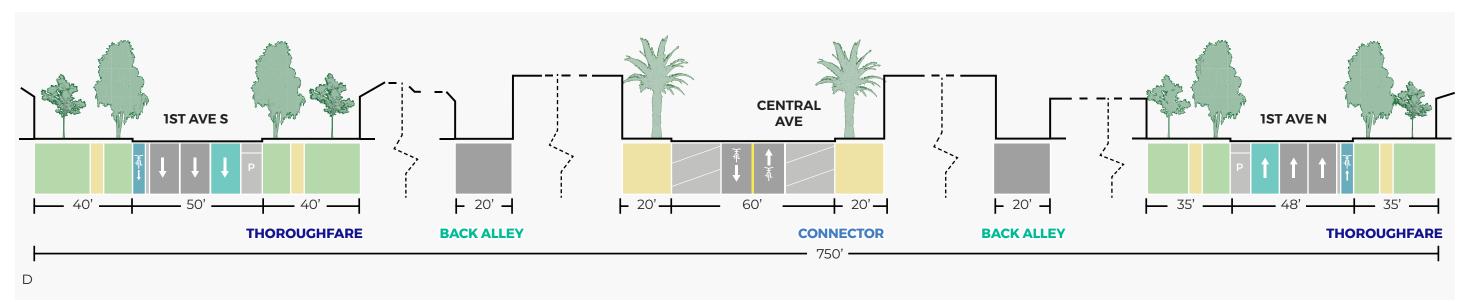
TYPICAL STREET SECTIONS (VIEW FROM EAST TO WEST)
